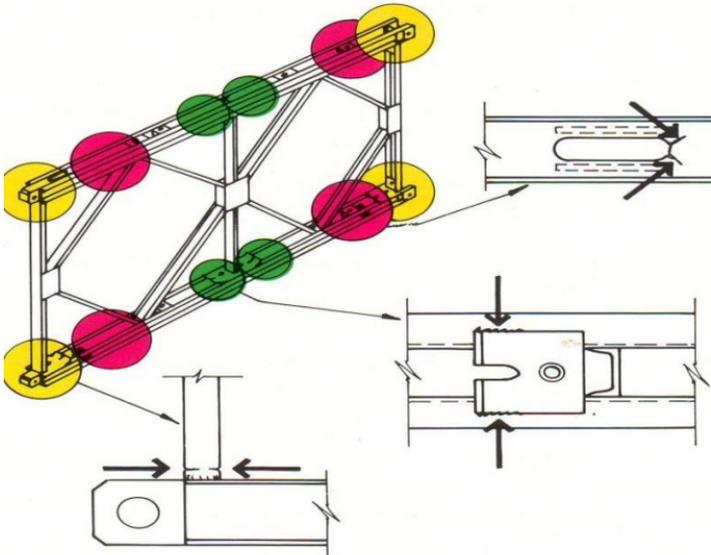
Check Points of Cracks for Bailey Panels
